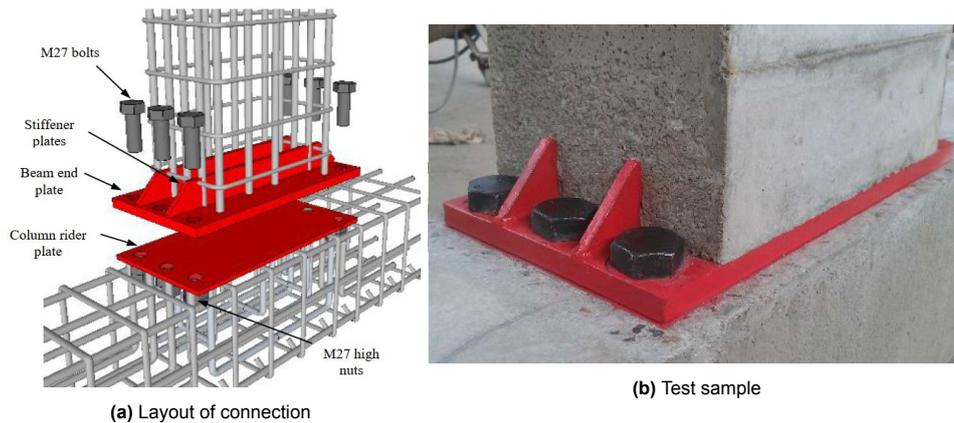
Successfully tested dry column to beam connection with rider plate [13]
